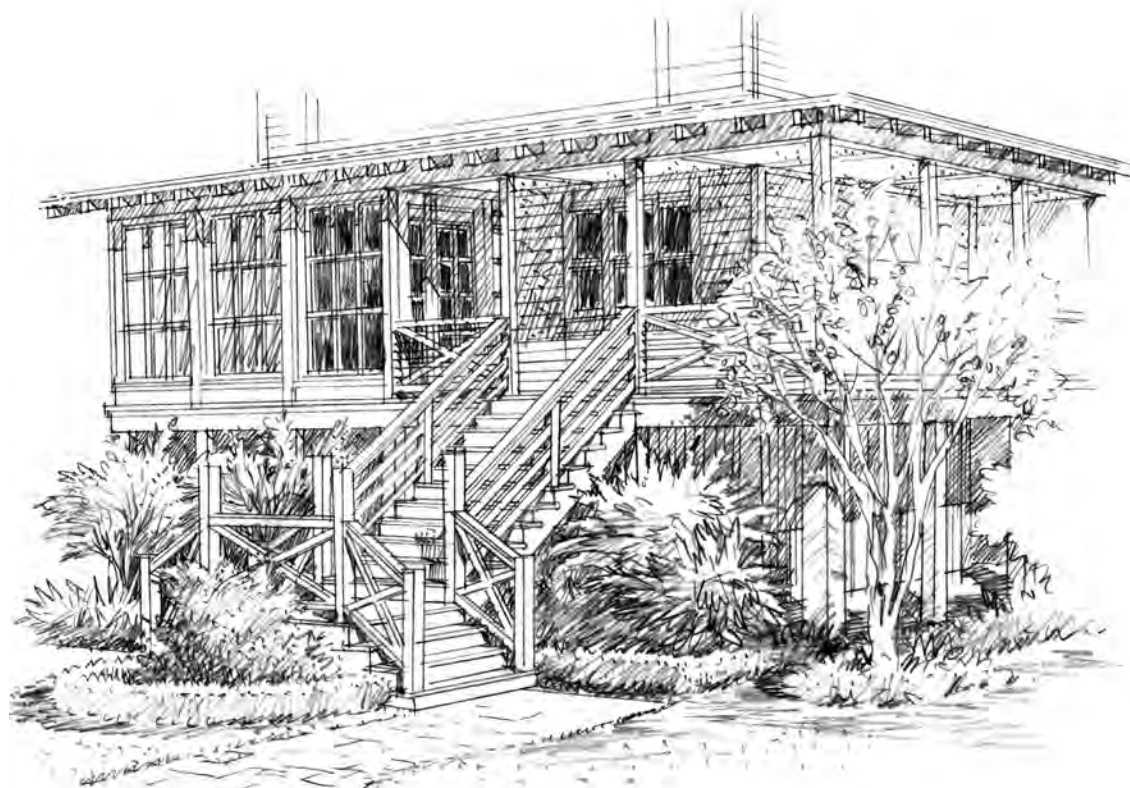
OUTDOOR STAIR DESIGN
